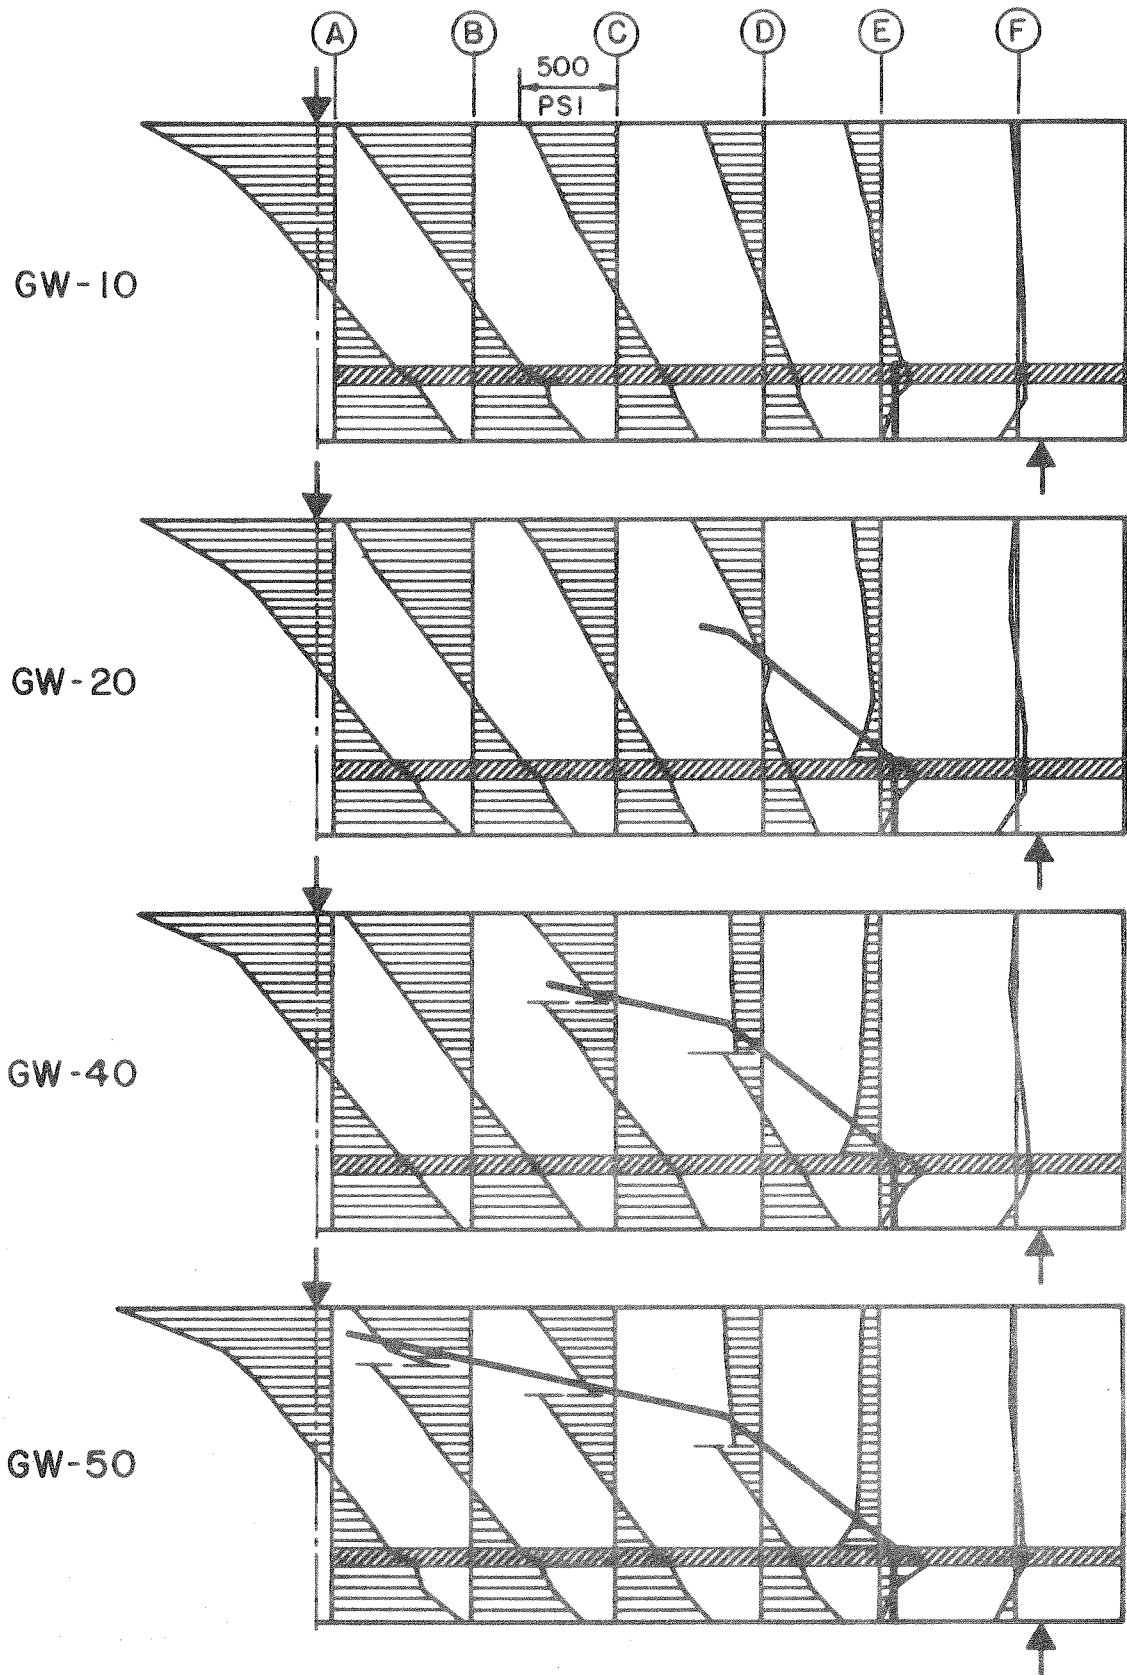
LONGITUDINAL STRESSES IN CONCRETE FOR GW-SERIES BEAMS
